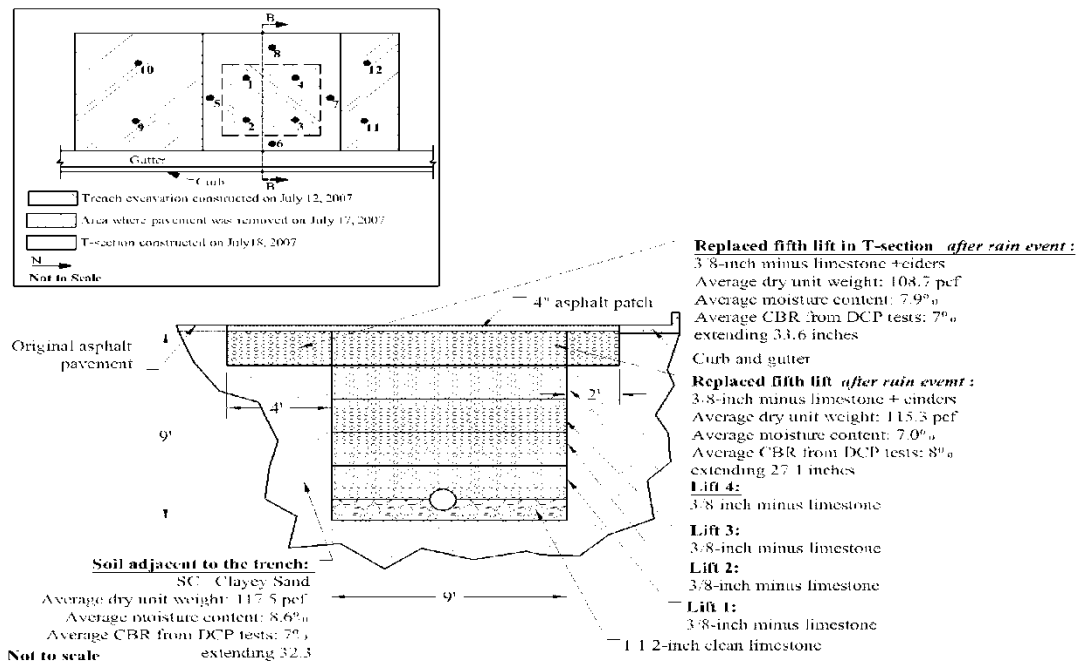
East-west cross-section of completed Trench B on July 25, 2007, after being left open for six days; (a) plan view, (b) cross-section
